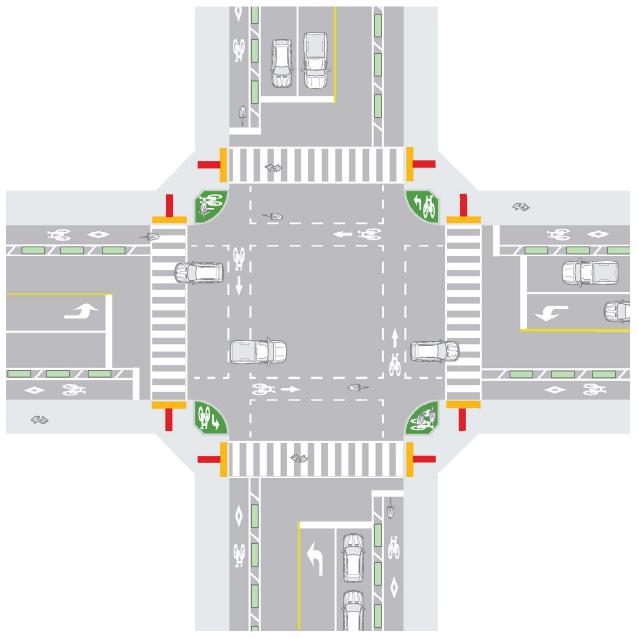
In-Boulevard Two-Stage Queue Box, Typical Intersection
